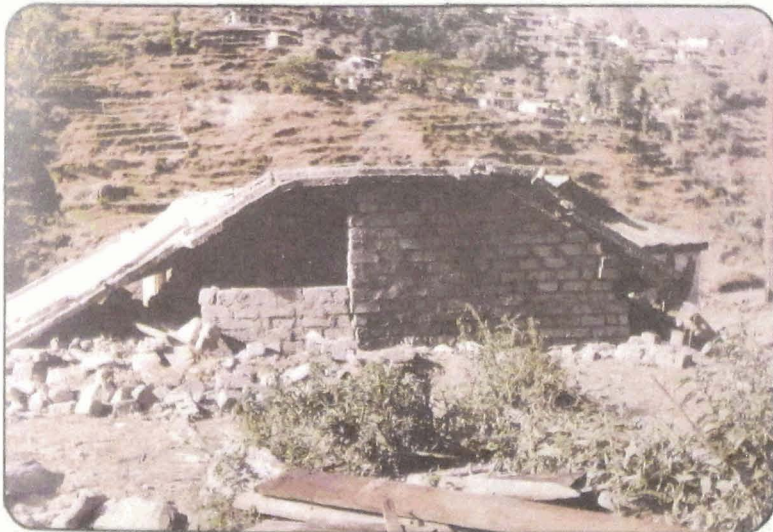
Partially collapsed end walls have resulted in a hut-like shape of the RCC roof slab in Byala Tipri village.
